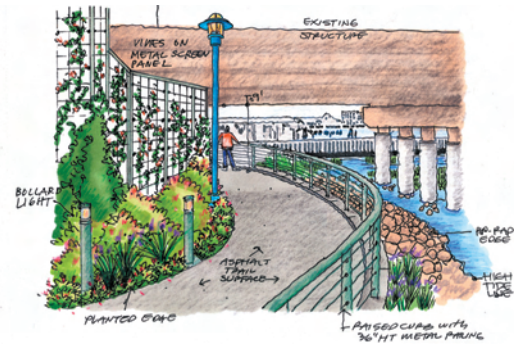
D.47: Sketch Concept of Trail Connection under the Causeway Overpass Looking South
